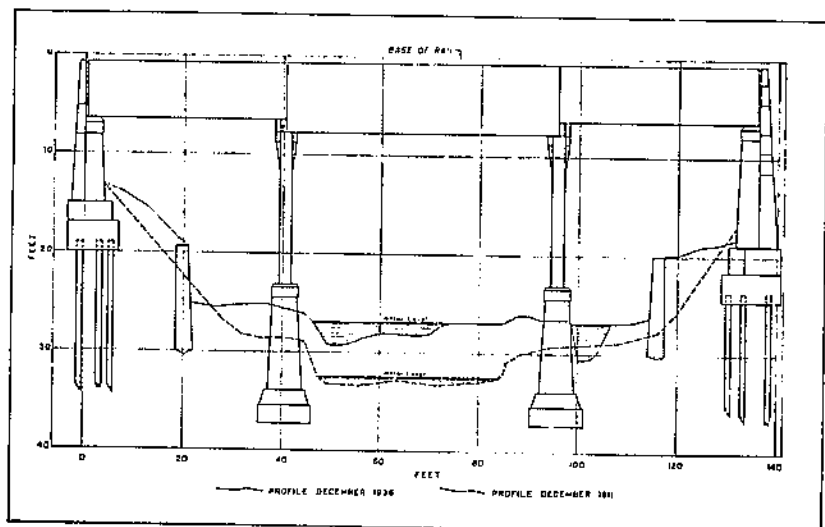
Cross section beneath Illinois Central Railway bridge No. 565 across Hurricane Creek, showing extent of aggradation between 1911 and 1936. Two retaining walls at 20 and 116 feet, which cause some of the discrepancy between the profiles near the bridge ends, are piers of an earlier bridge but were not shown on the 1911 profile.
